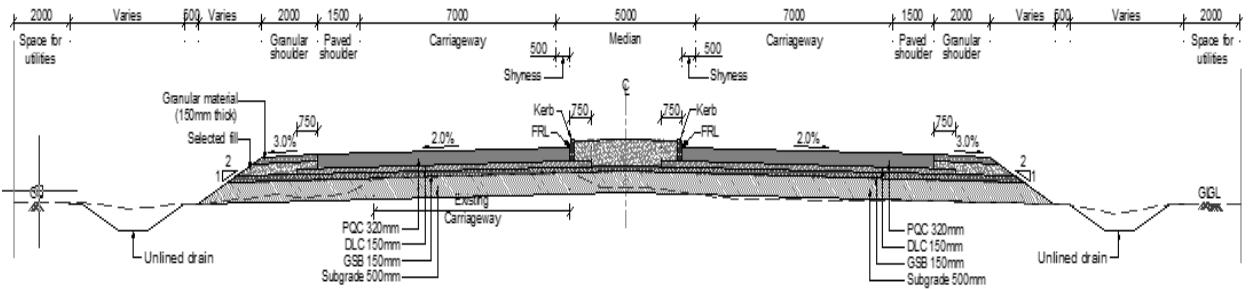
TCS 1A.2- 4 Lane Rural Area (Left Side Existing Road)
